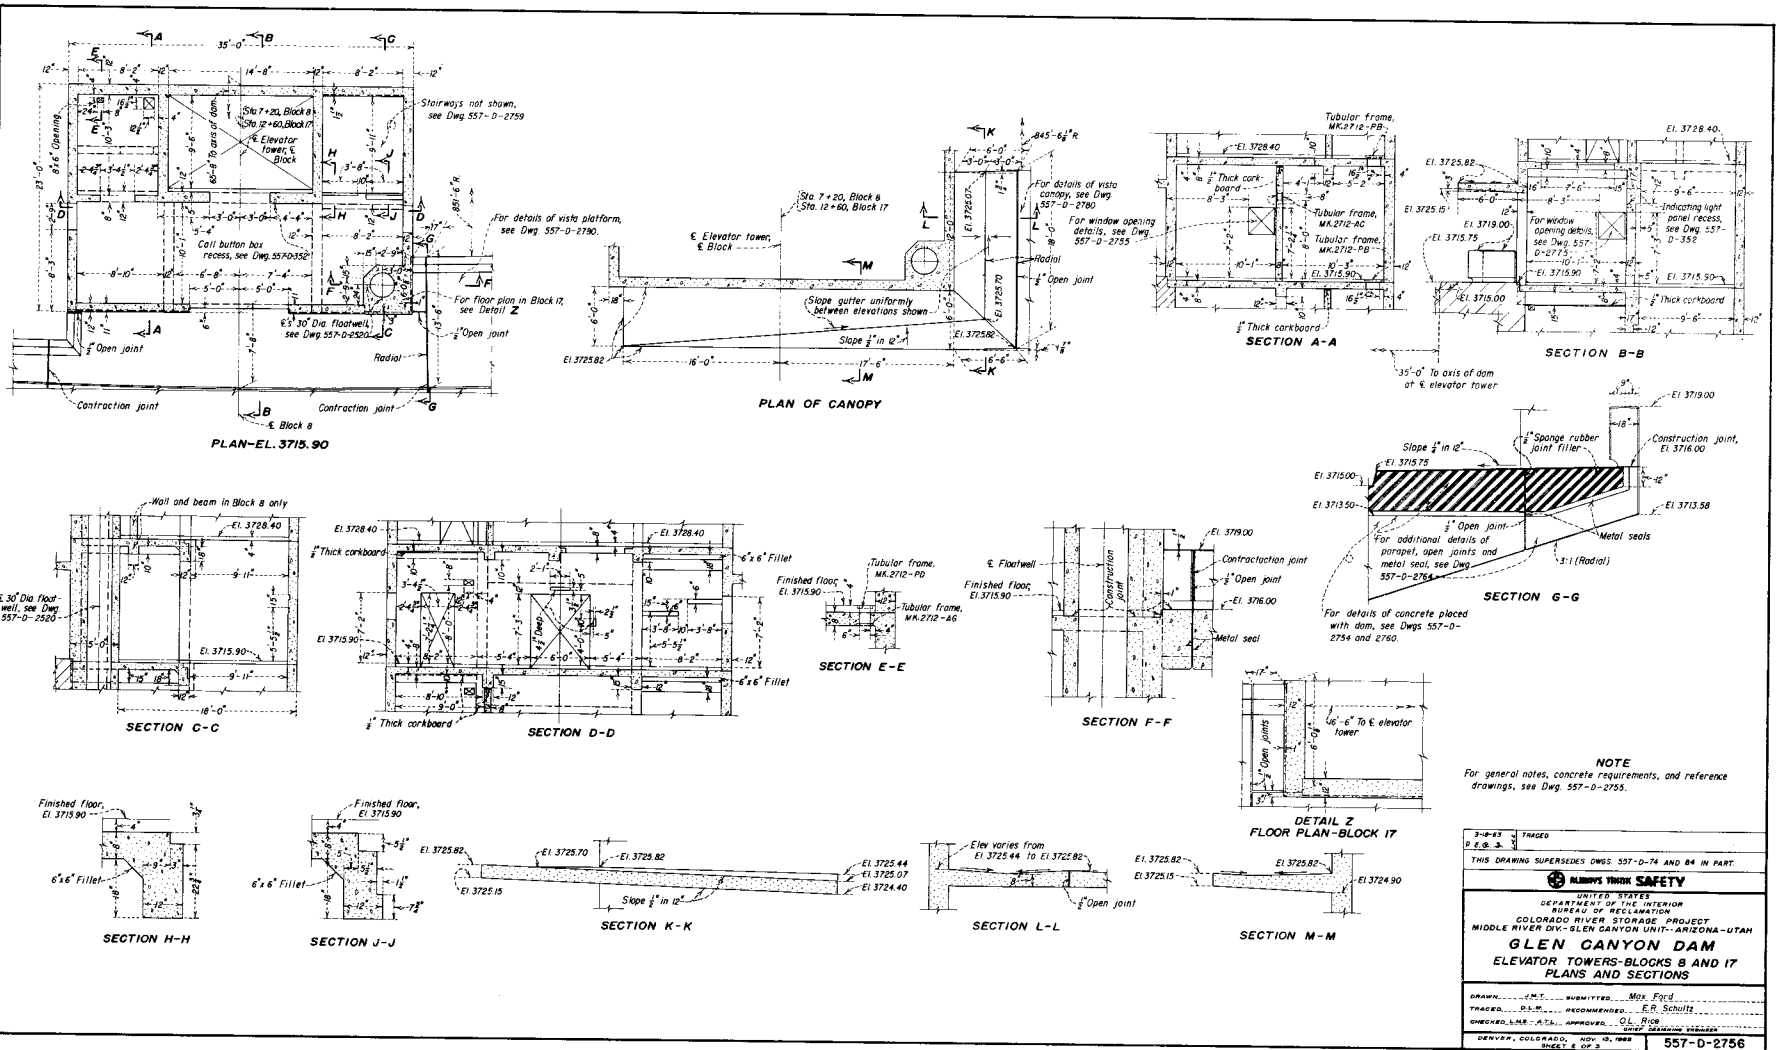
Dam elevator towers, blocks 8 and 17—Plans and sections. (Sheet 1 of 3.)
